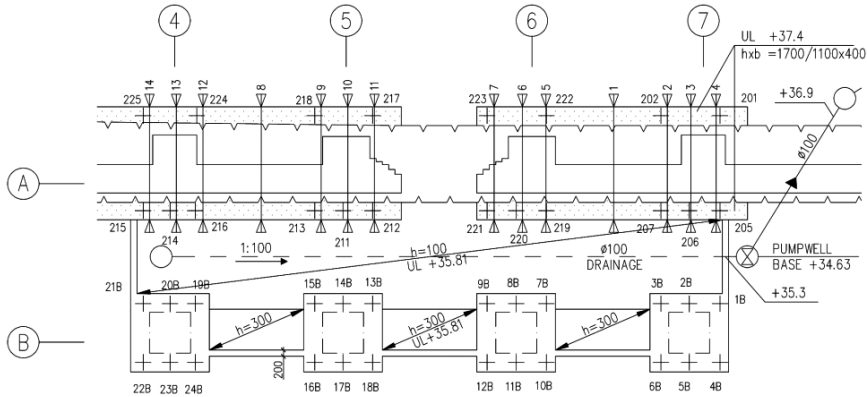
Line B in St. John's Church. Piled foundations of reconstructed columns and foundation of wall for burial chamber.
